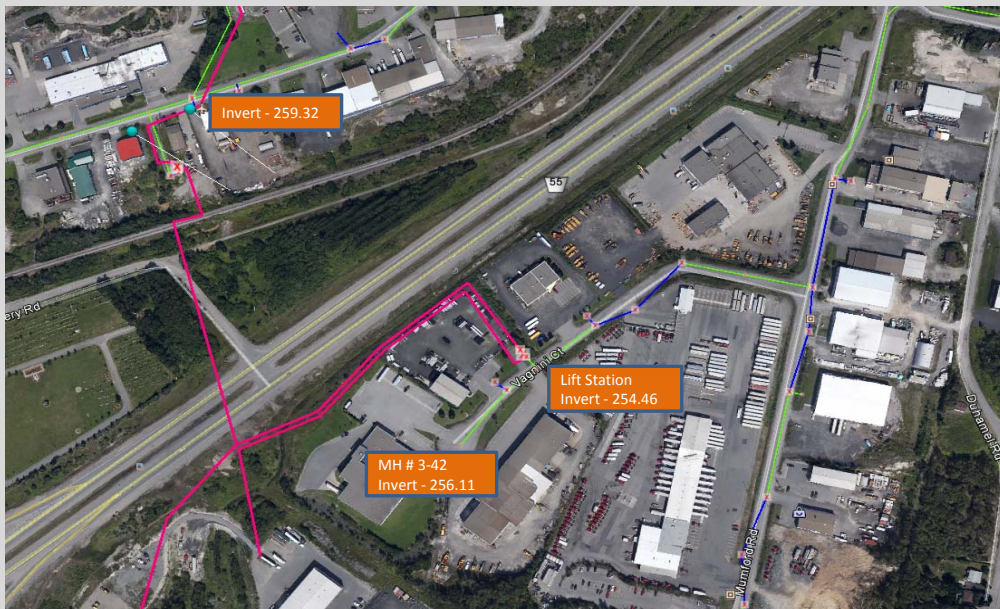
Manhole location, invert, and proposed development locations surrounding Vagnini Pumping Station
